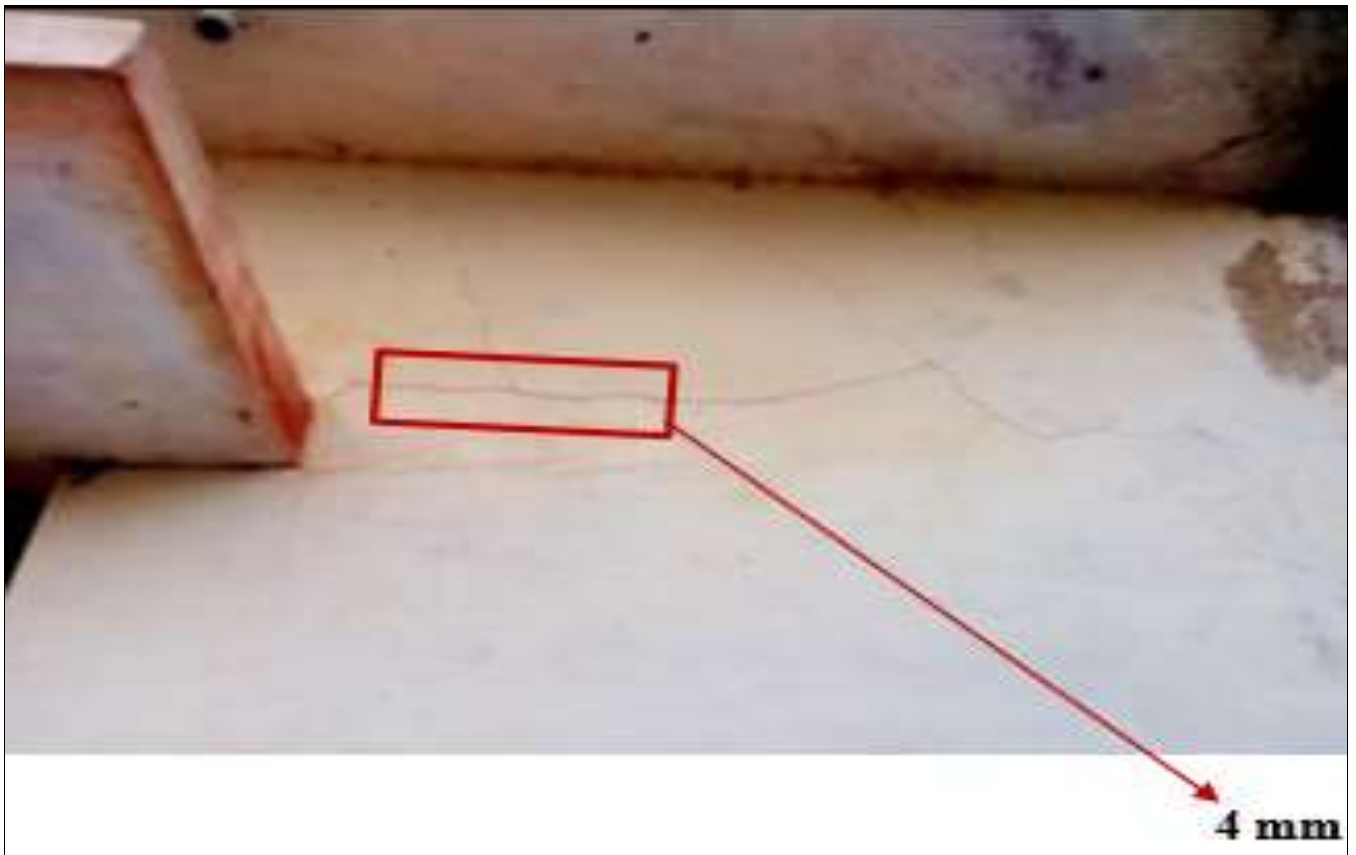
Location L 10 Horizontal crack 1800 mm length, crack width = 4mm
